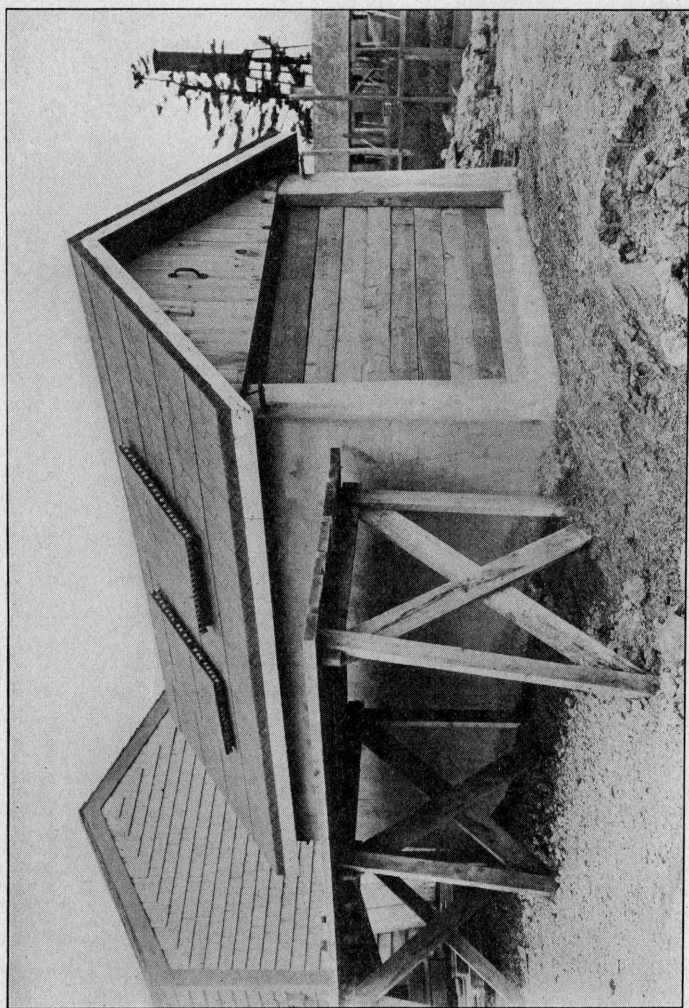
Photograph of manure shed on poultry plant of Maine Agricultural Experiment Station. Note walk, trap-doors in roof, plank end, and removable gable.
